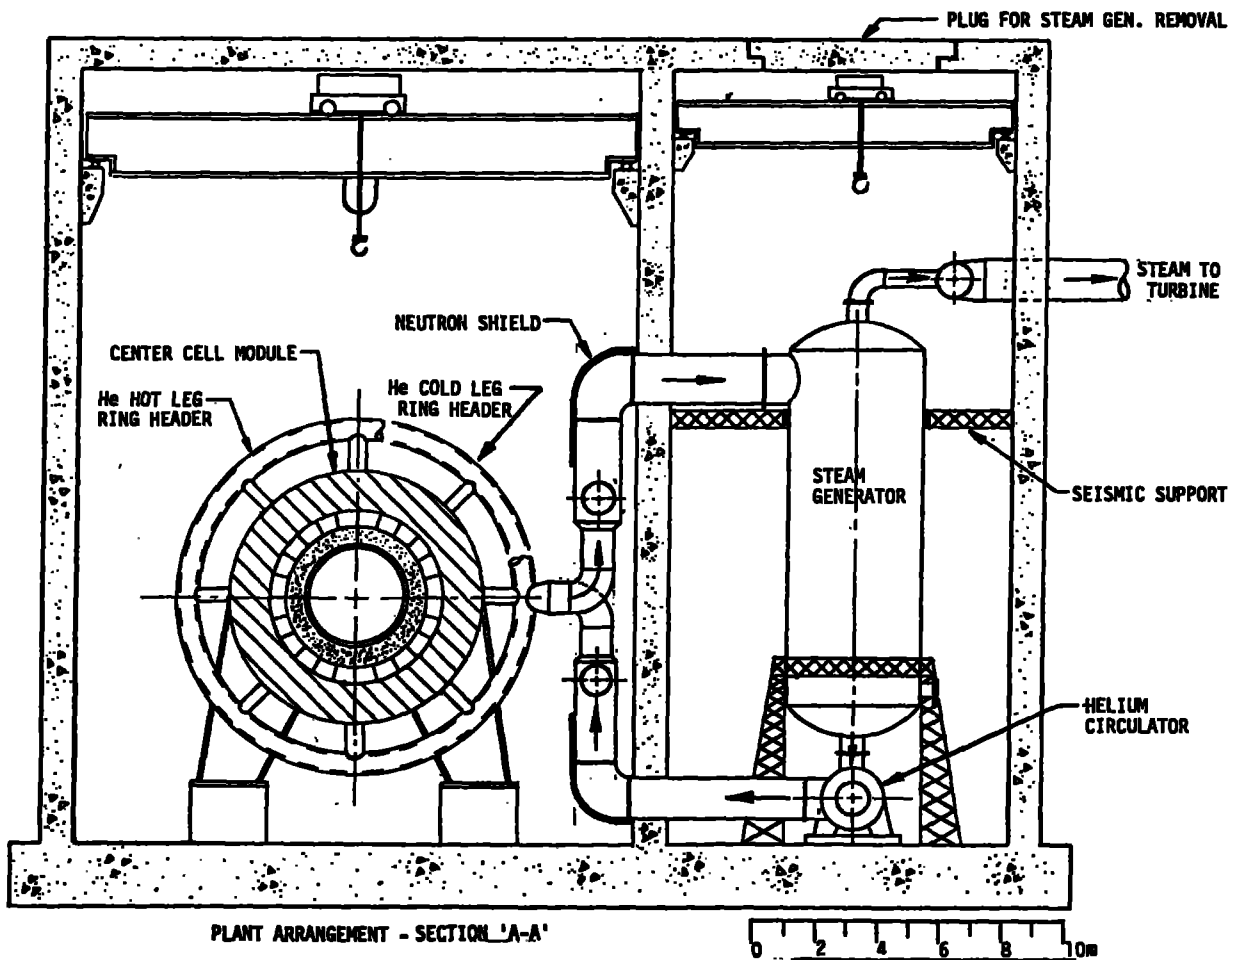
Heat transport system, showing piping and equipment arrangement (side view).
